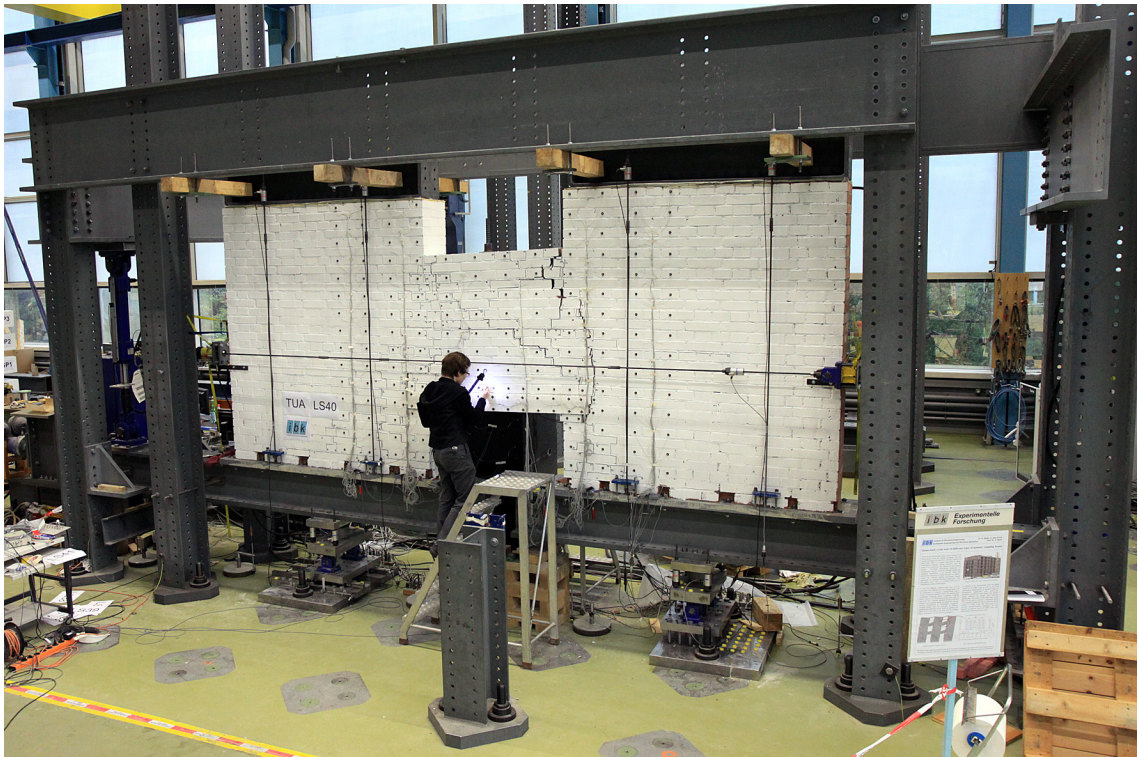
Photo of the test setup for the masonry spandrels with timber lintel (TUA and TUB). View from the East during testing of TUA.
